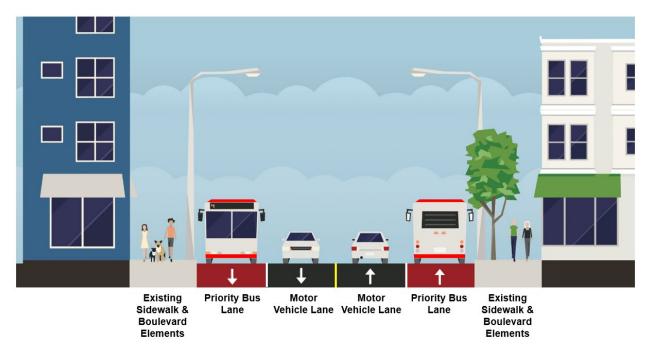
Typical Cross-Section, Bathurst Street North of Barton Avenue
